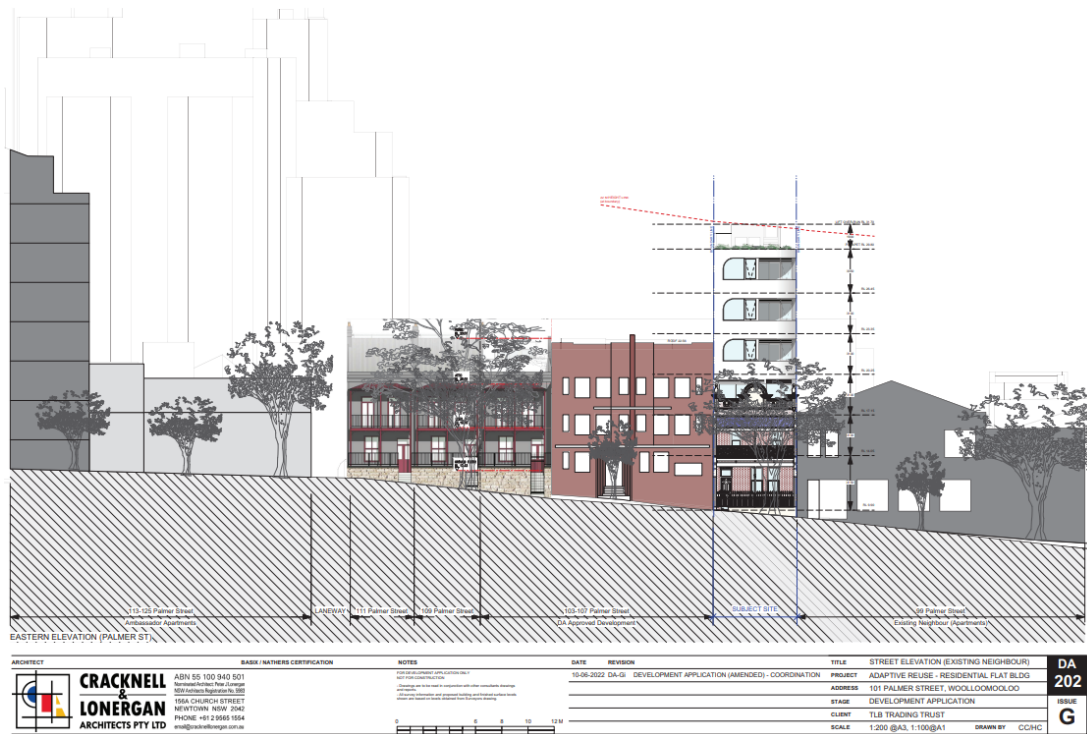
Proposed east Palmer St context elevation (existing development shown adjacent)
